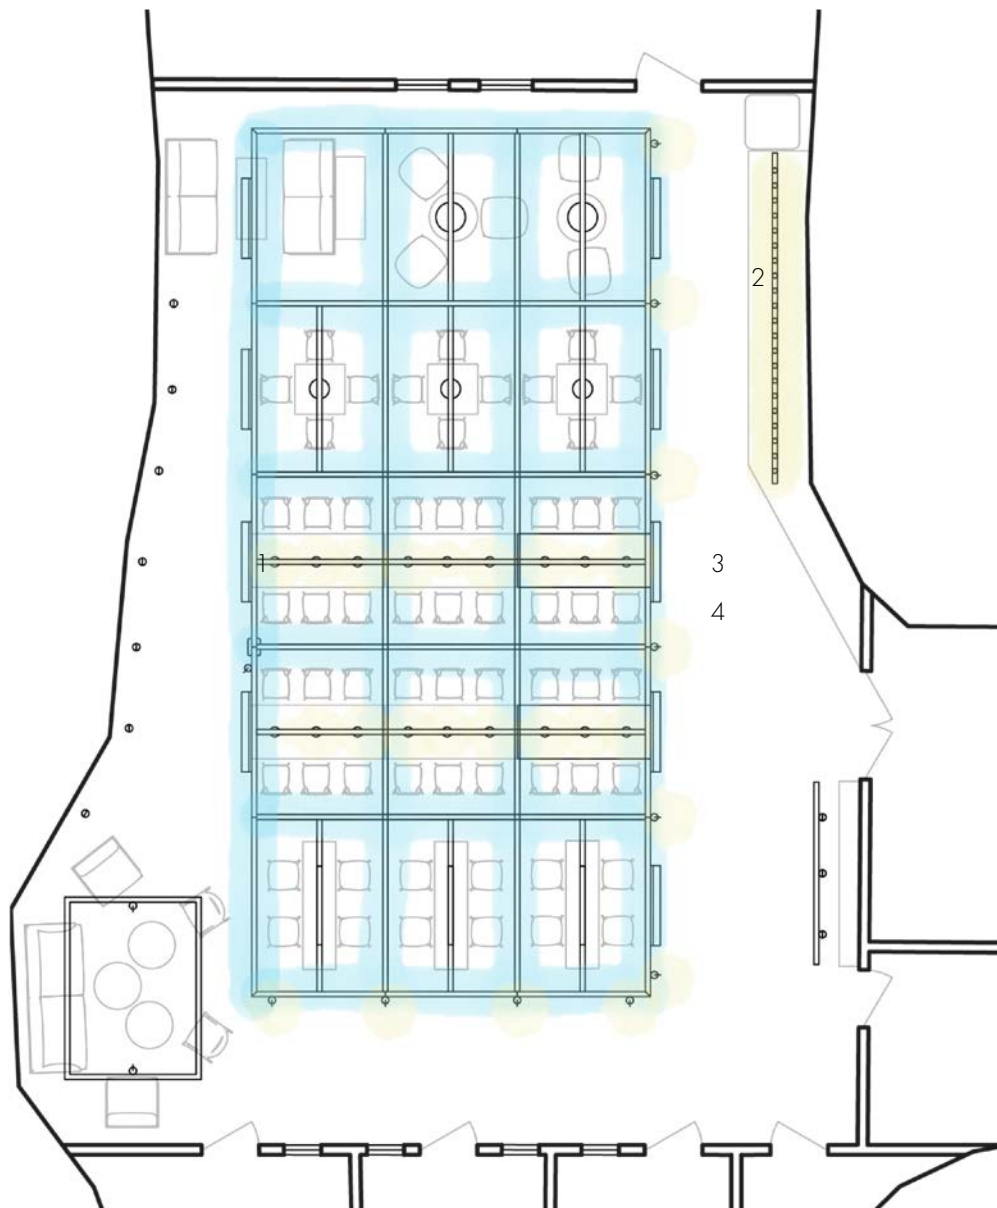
Sketch of lighting plan for scenario 3 in Retka
